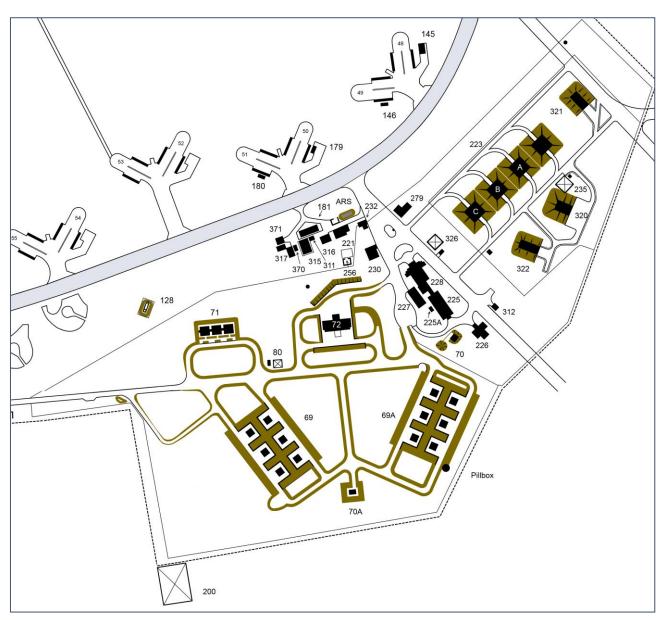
Bomb store and AAGW site plan as it existed in 2000
